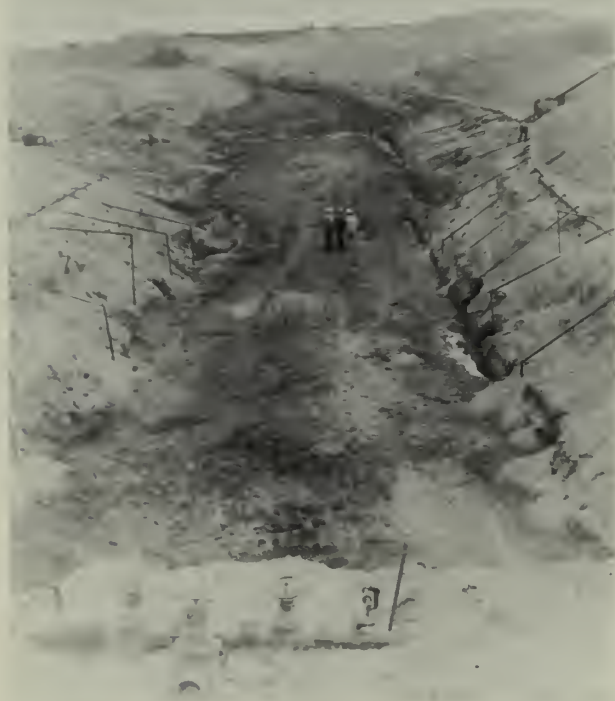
Portion of cutoff trench excavation for Dickinson Dam, a small earthfill structure on the Heart River in North Dakota. HD-P-182.
